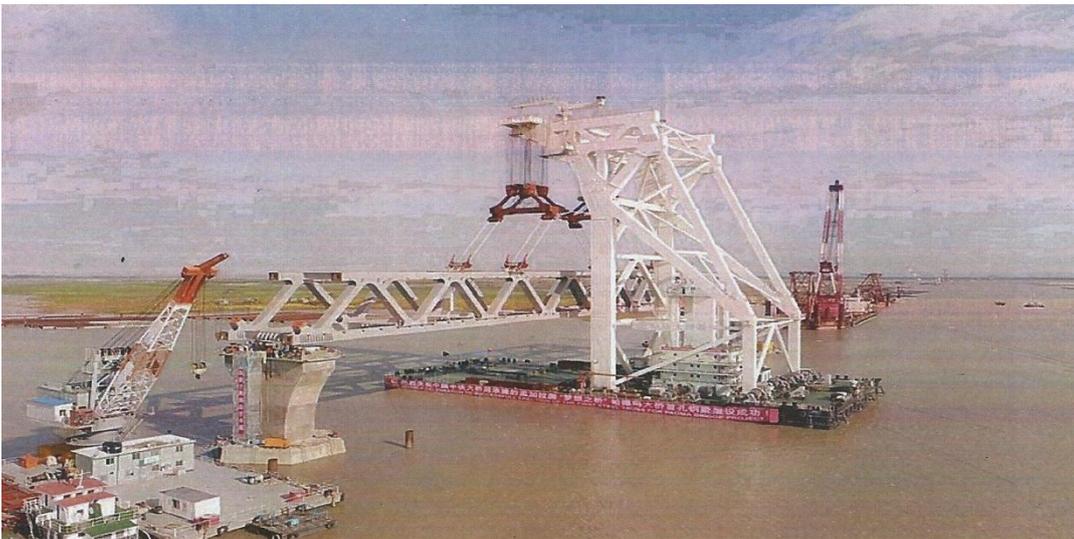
Erection of fabricated 3088 metric ton fabricated truss on two adjacent piers by 4000 metric ton capacity barge mounted crane.
